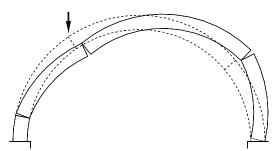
Four-hinge failure mechanism of a semi-circular masonry arch submitted to an asymmetrical loading.
